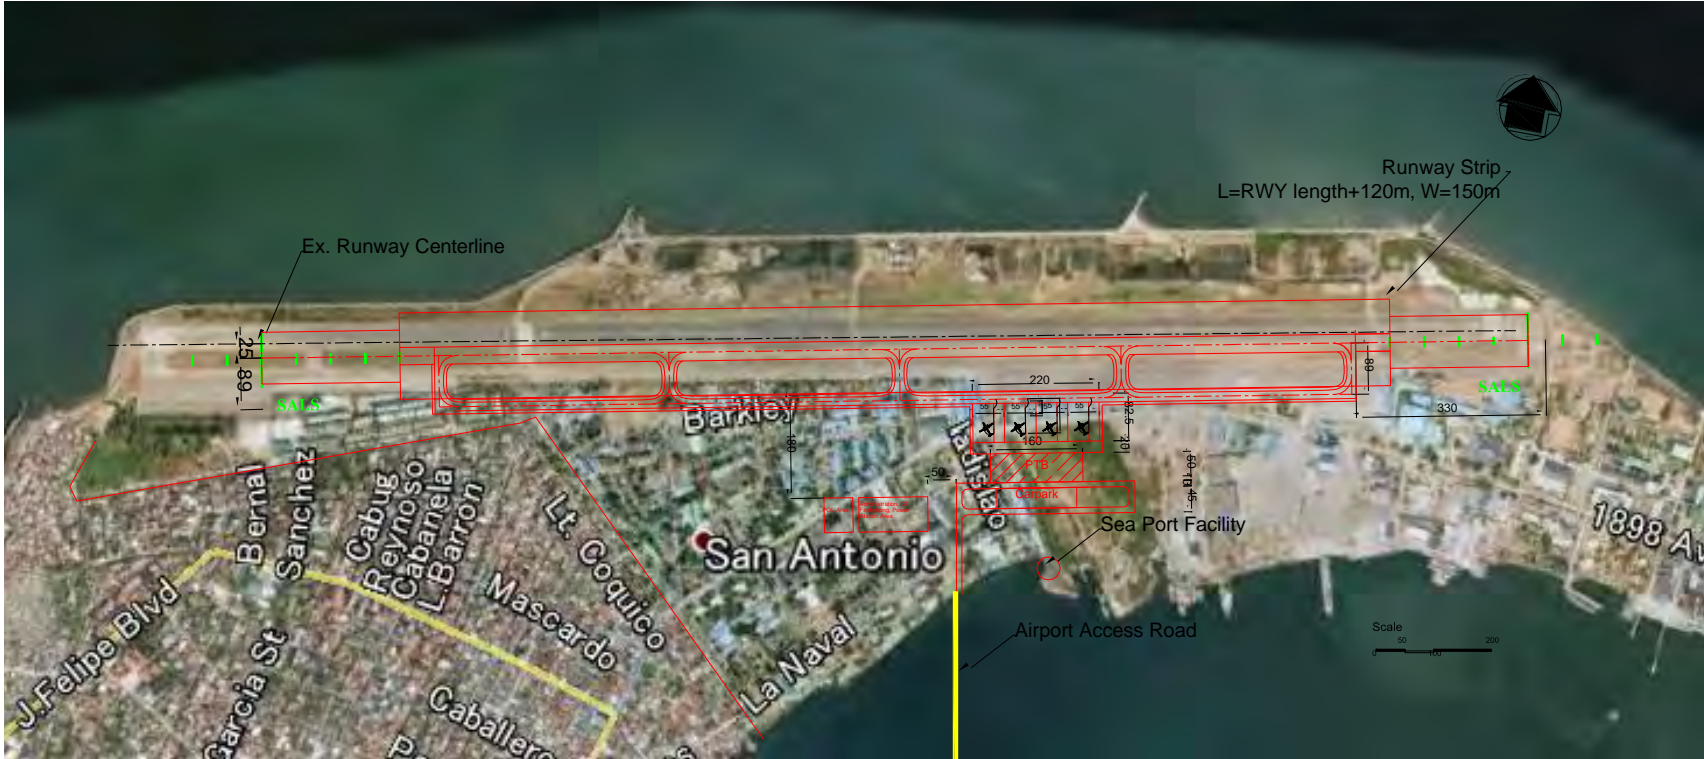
Improvement Layout Plan Case-2
